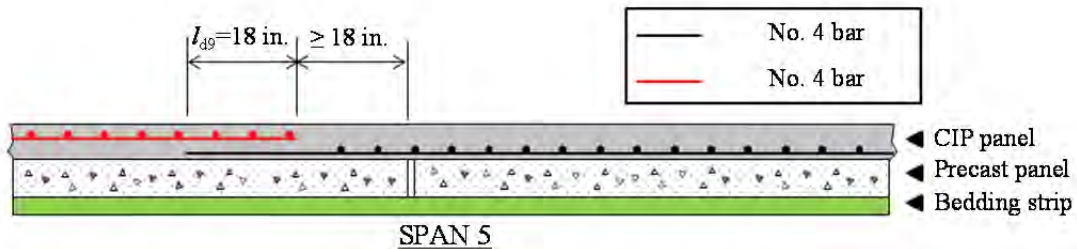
Details of longitudinal splices, Lampasas River Bridge (Section L-L)
